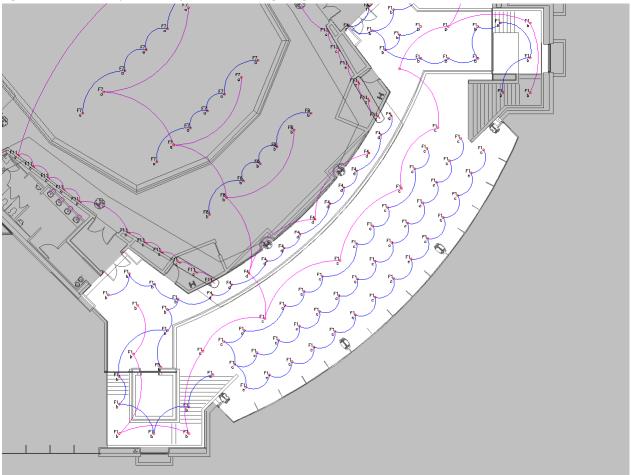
Main Lobby – Balcony Level South Lighting Plan
